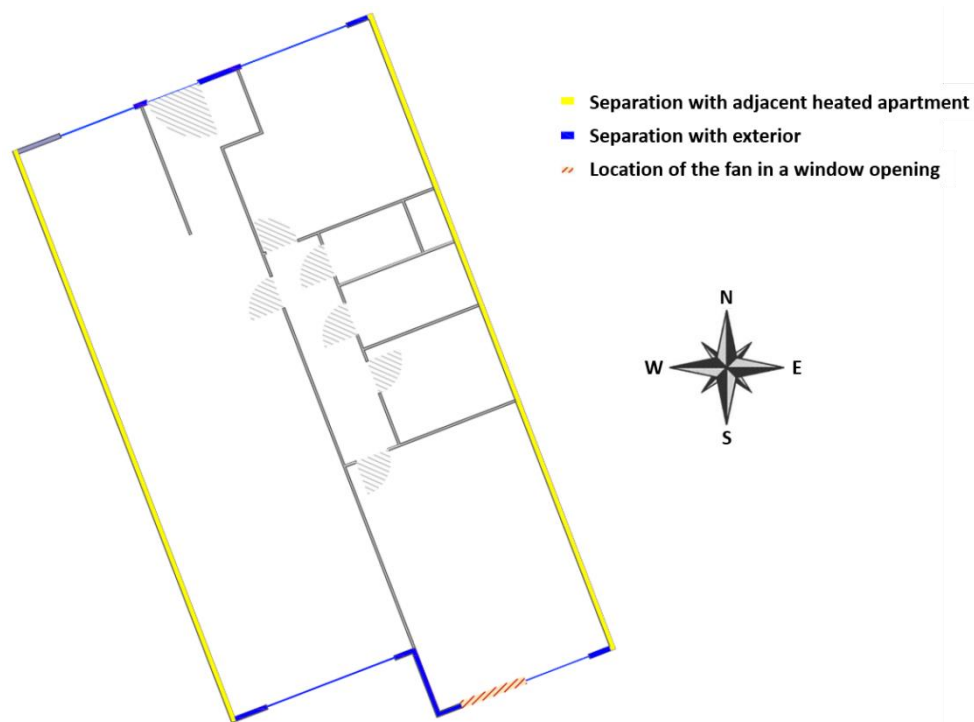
Plan of the tested apartment, including separation type and fan location.
